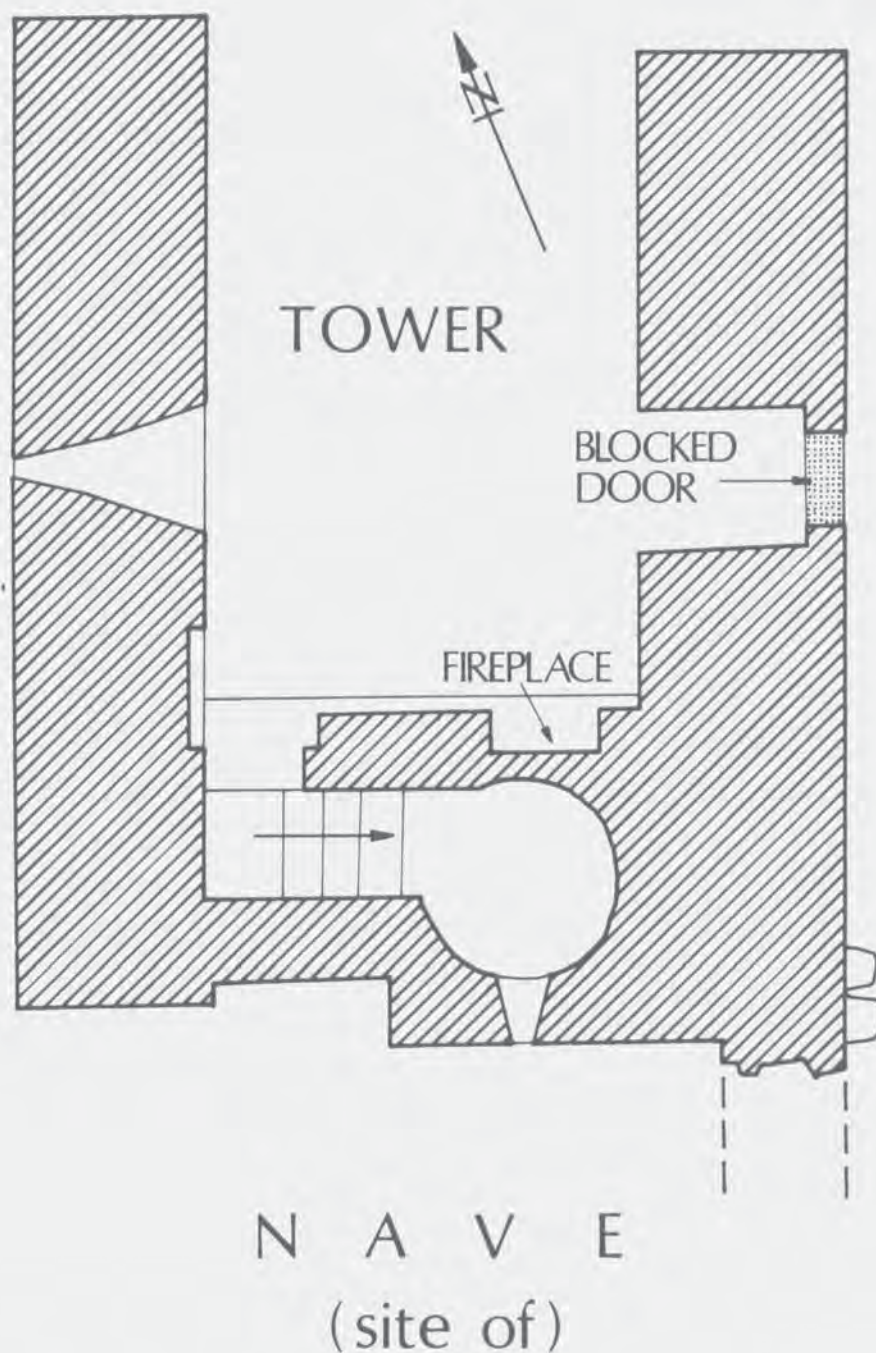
Dunboyne St. Peter & Paul's church: tower: ground plan (after O.P.W.).
